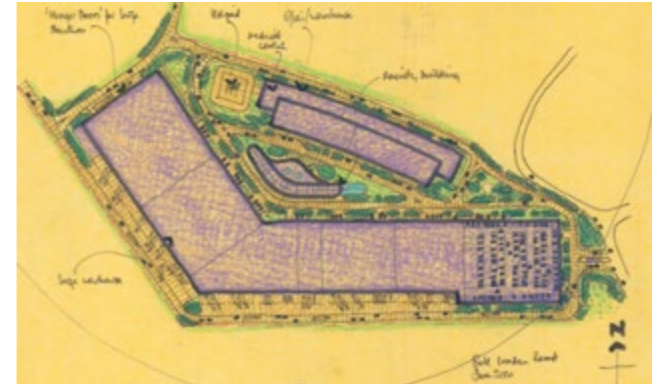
Masterplan Sketch - Gate 1 Back of House
